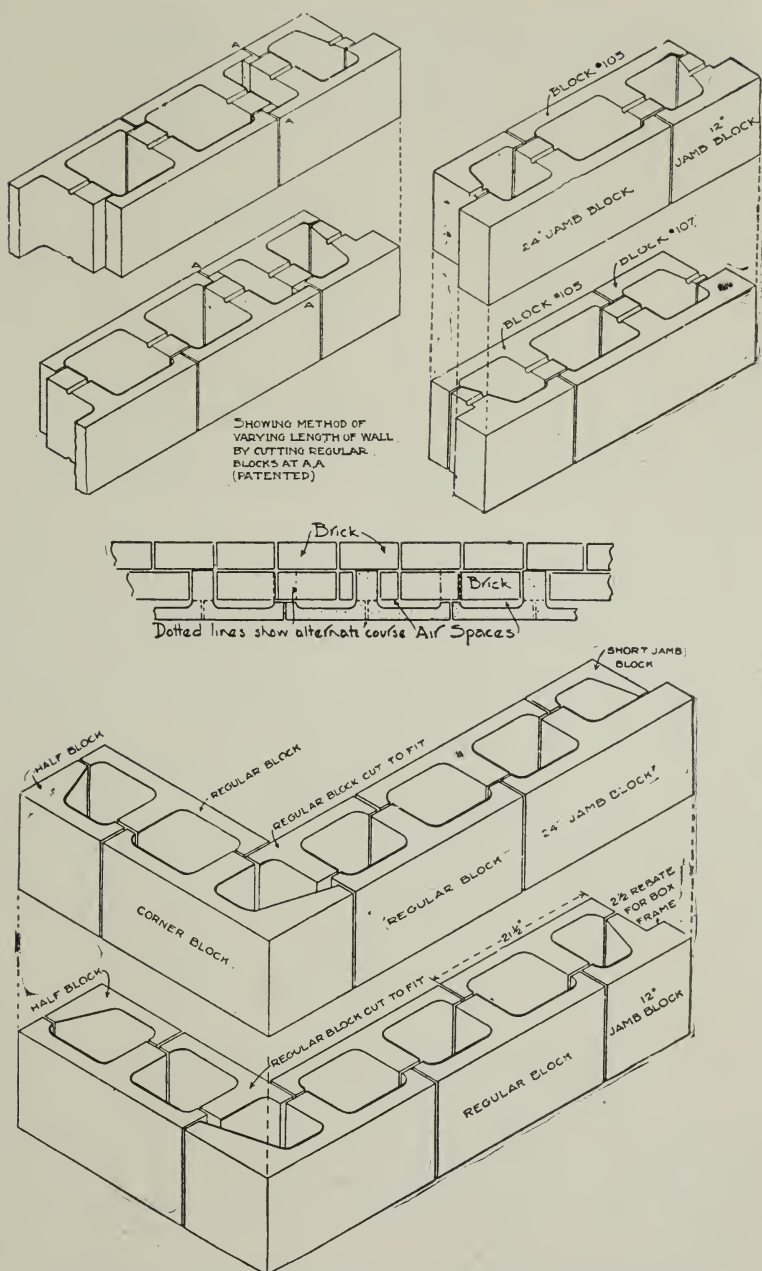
Two-piece Concrete Blocks. Details of Wall Construction.
